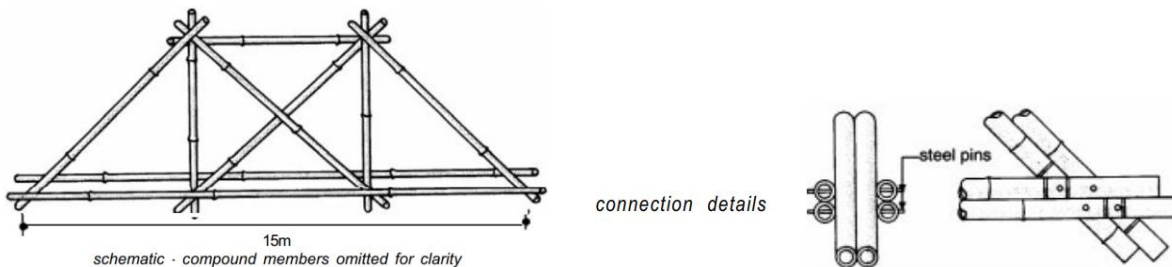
Queen post truss bridge (after Janssen/Kumpe, 1982)
